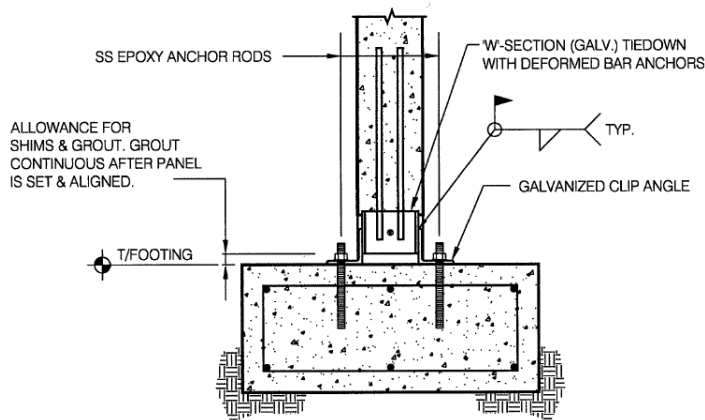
Welded Foundation to Connection (Ward)
